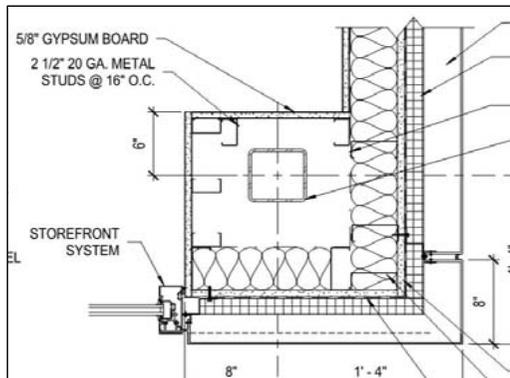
Wall-to-storefront system detail, depicting a misalignment between the fenestration and opaque wall.
